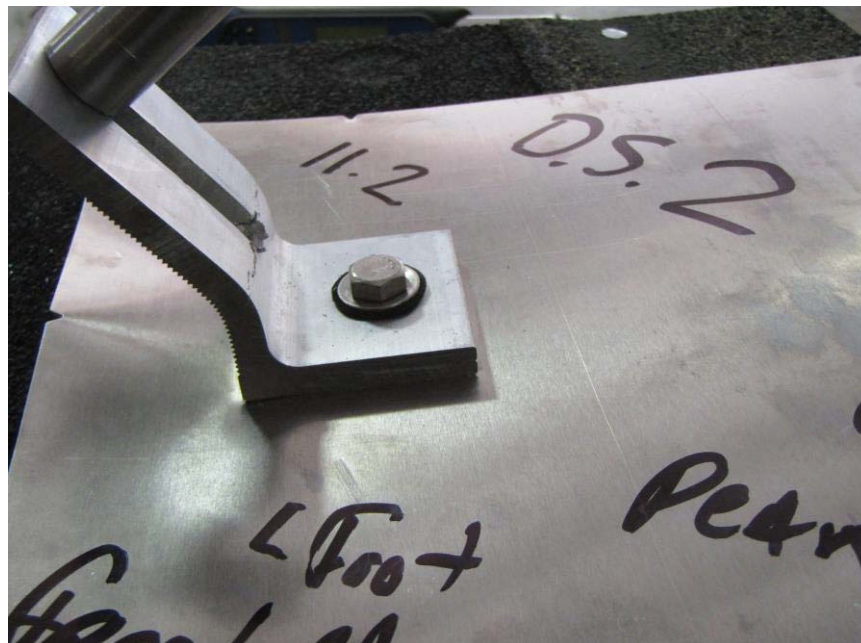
Lateral Parallel to Rafter Eccentric Load (post-test) - Downslope
